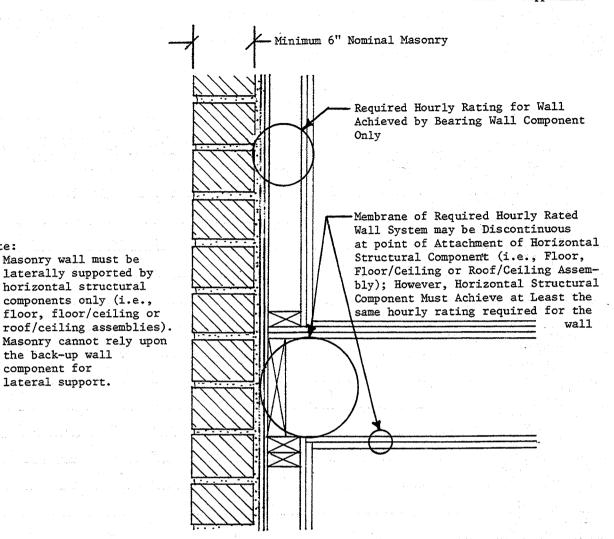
B Combination Masonry/Frame Wall (Bearing and Non-Bearing Condition)
